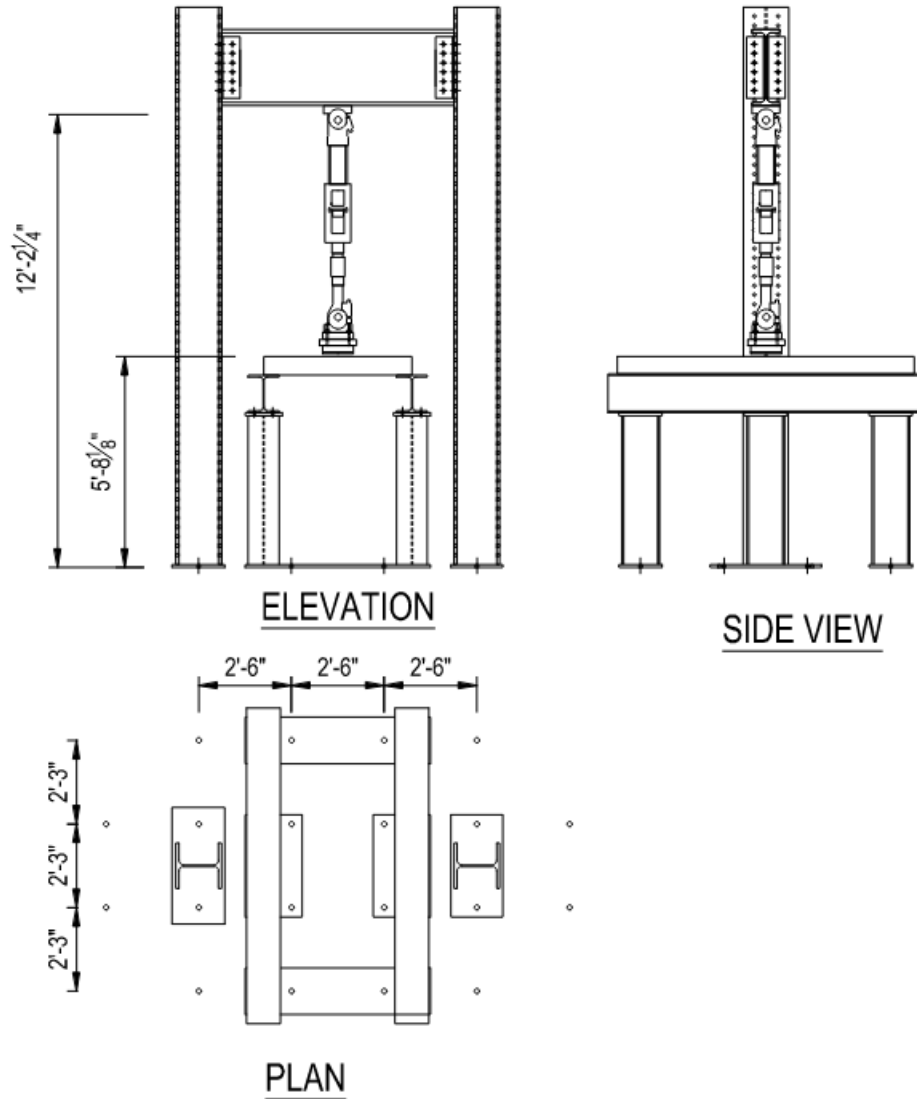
Elevation, side view, and plan view of support fixtures (1 inch = 2.54 cm)
